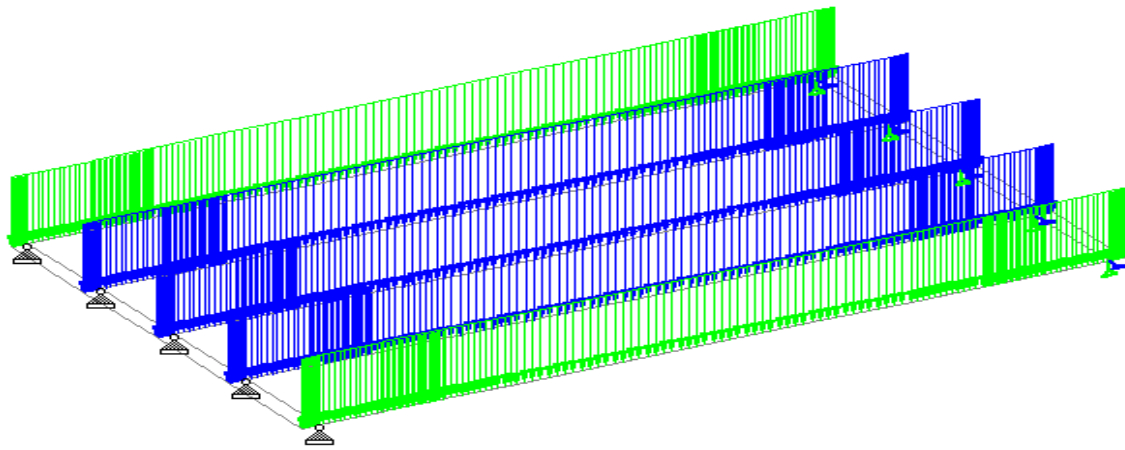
Dead Load on RCC Girder from Deck Slab above the Girder.
